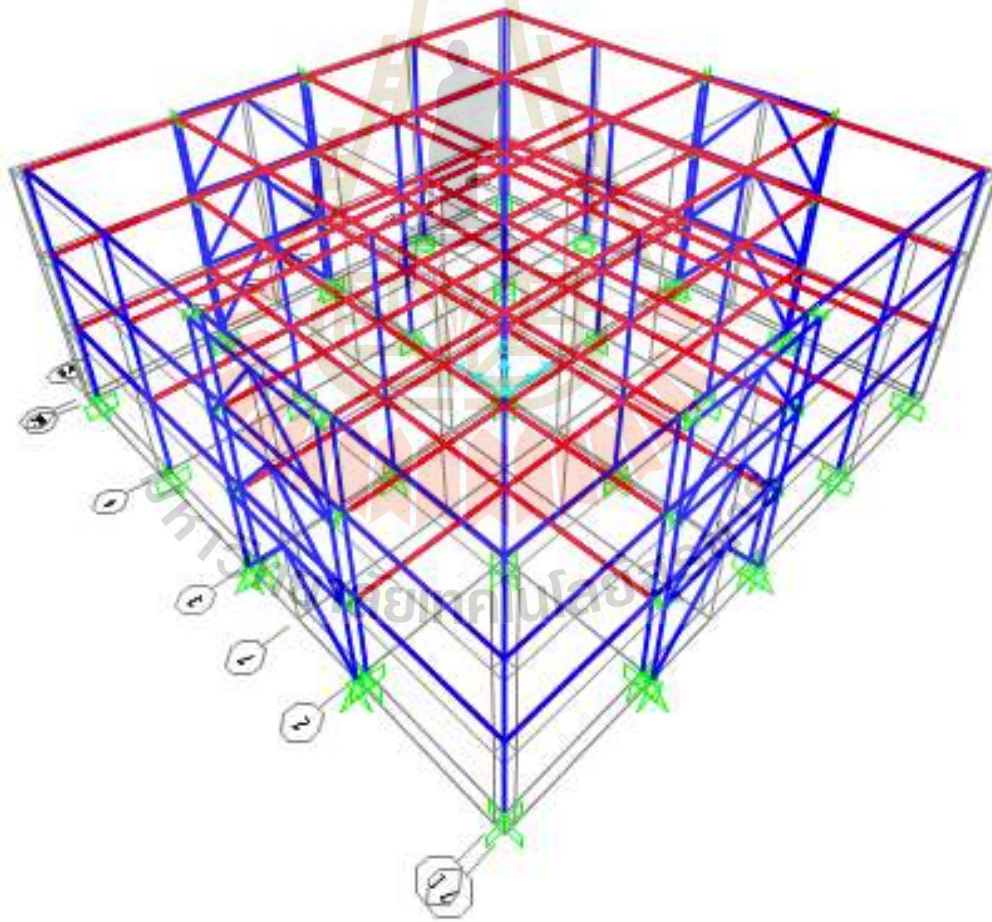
3D view of nine-story building. (SAP2000)
